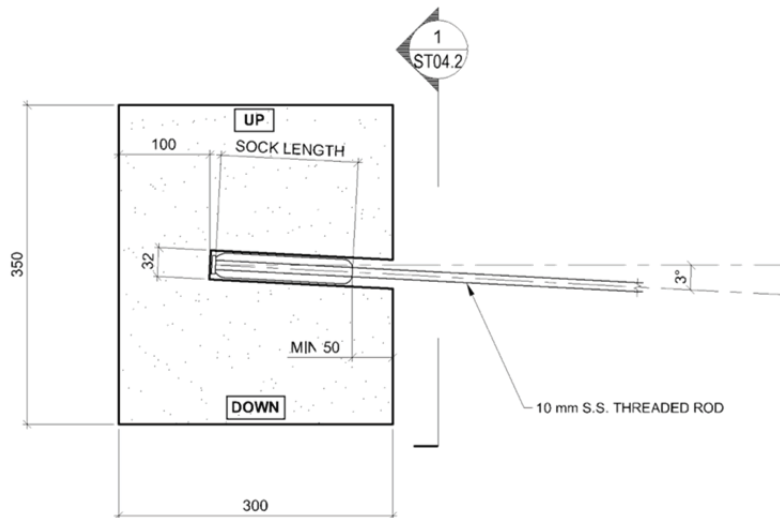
Requirement for Sample Inclination: Shop Drawings (PWGSC)
